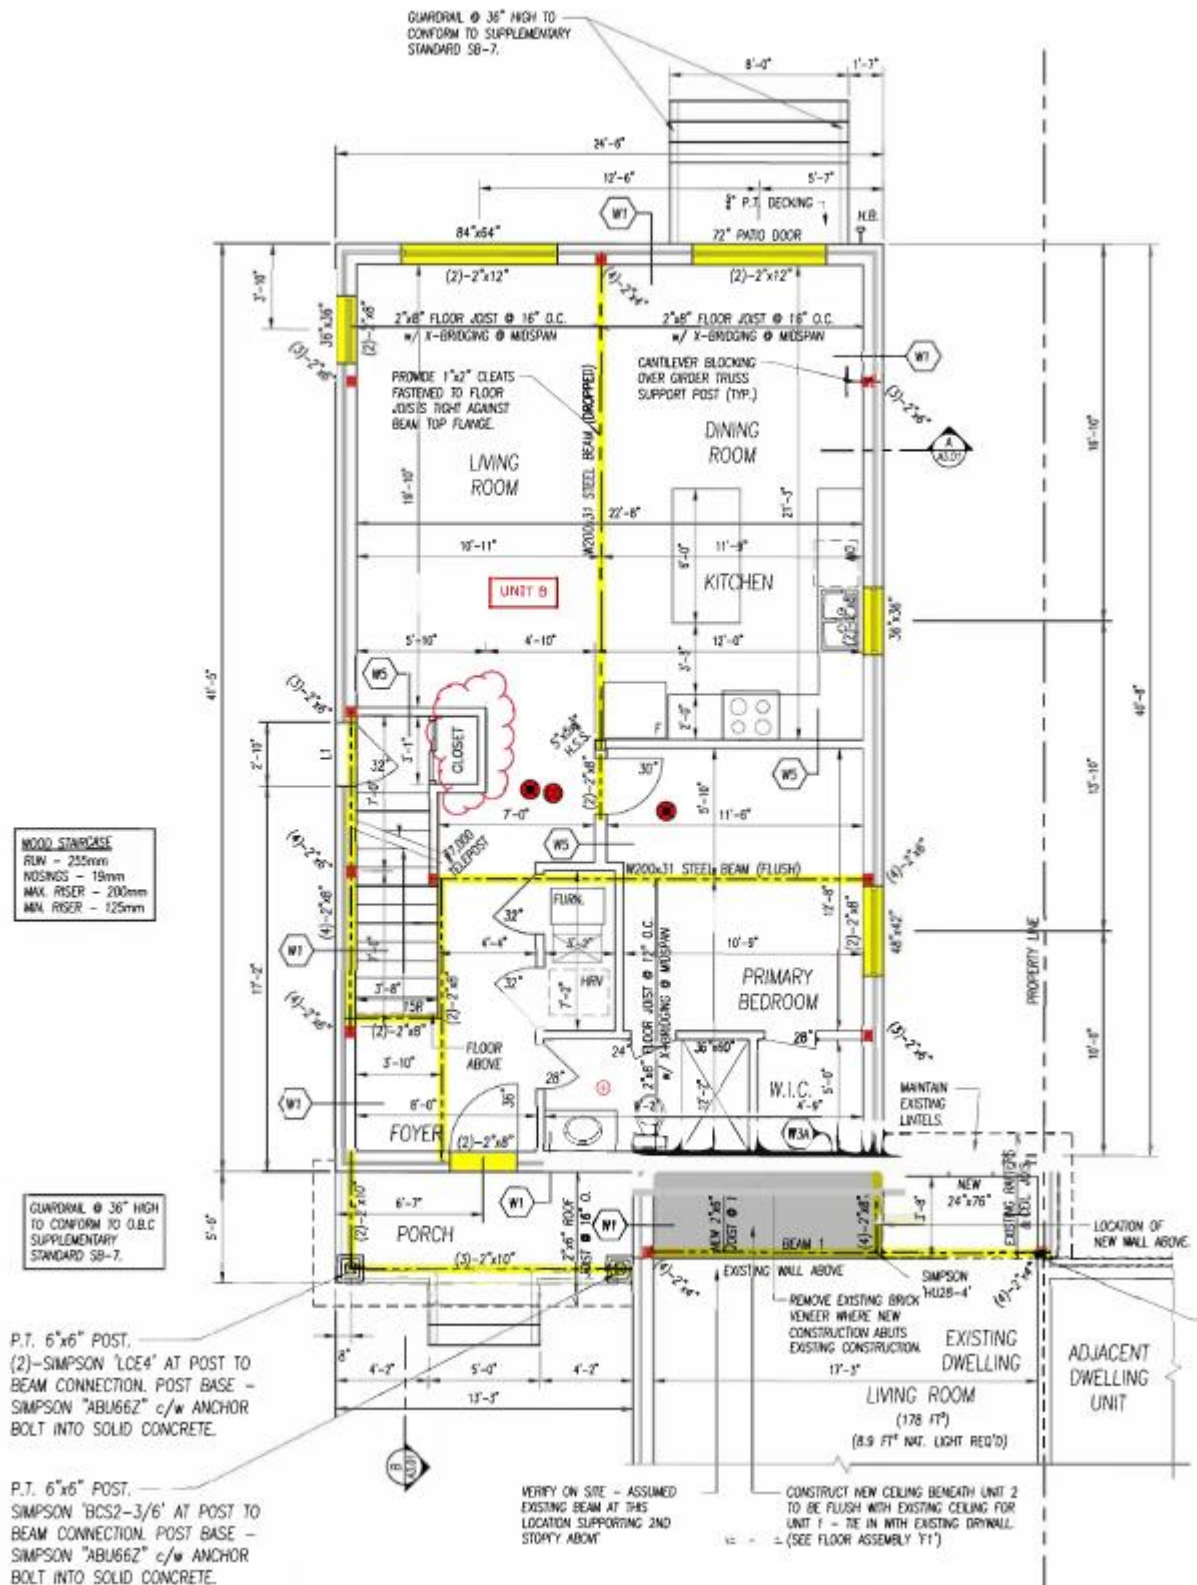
Existing main floor plan for second unit in 2 storey addition.
